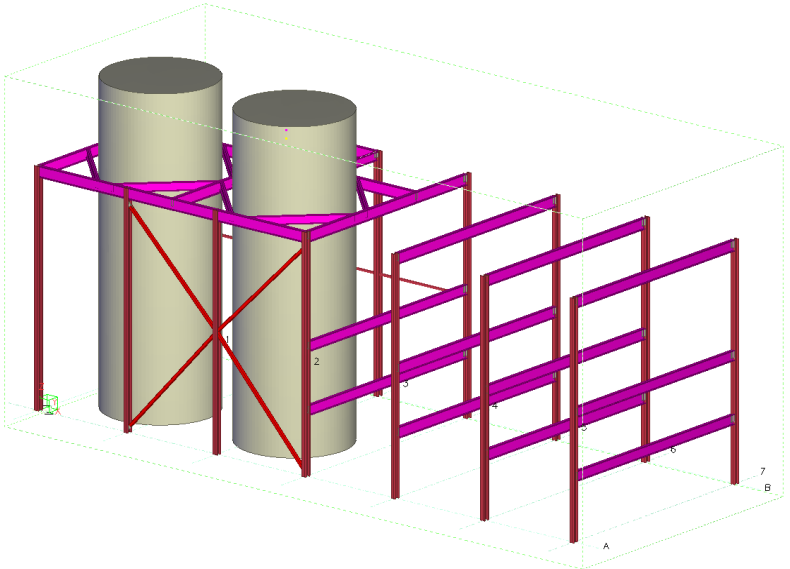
Placement of beams over the silos (Structures, Tekla.)
